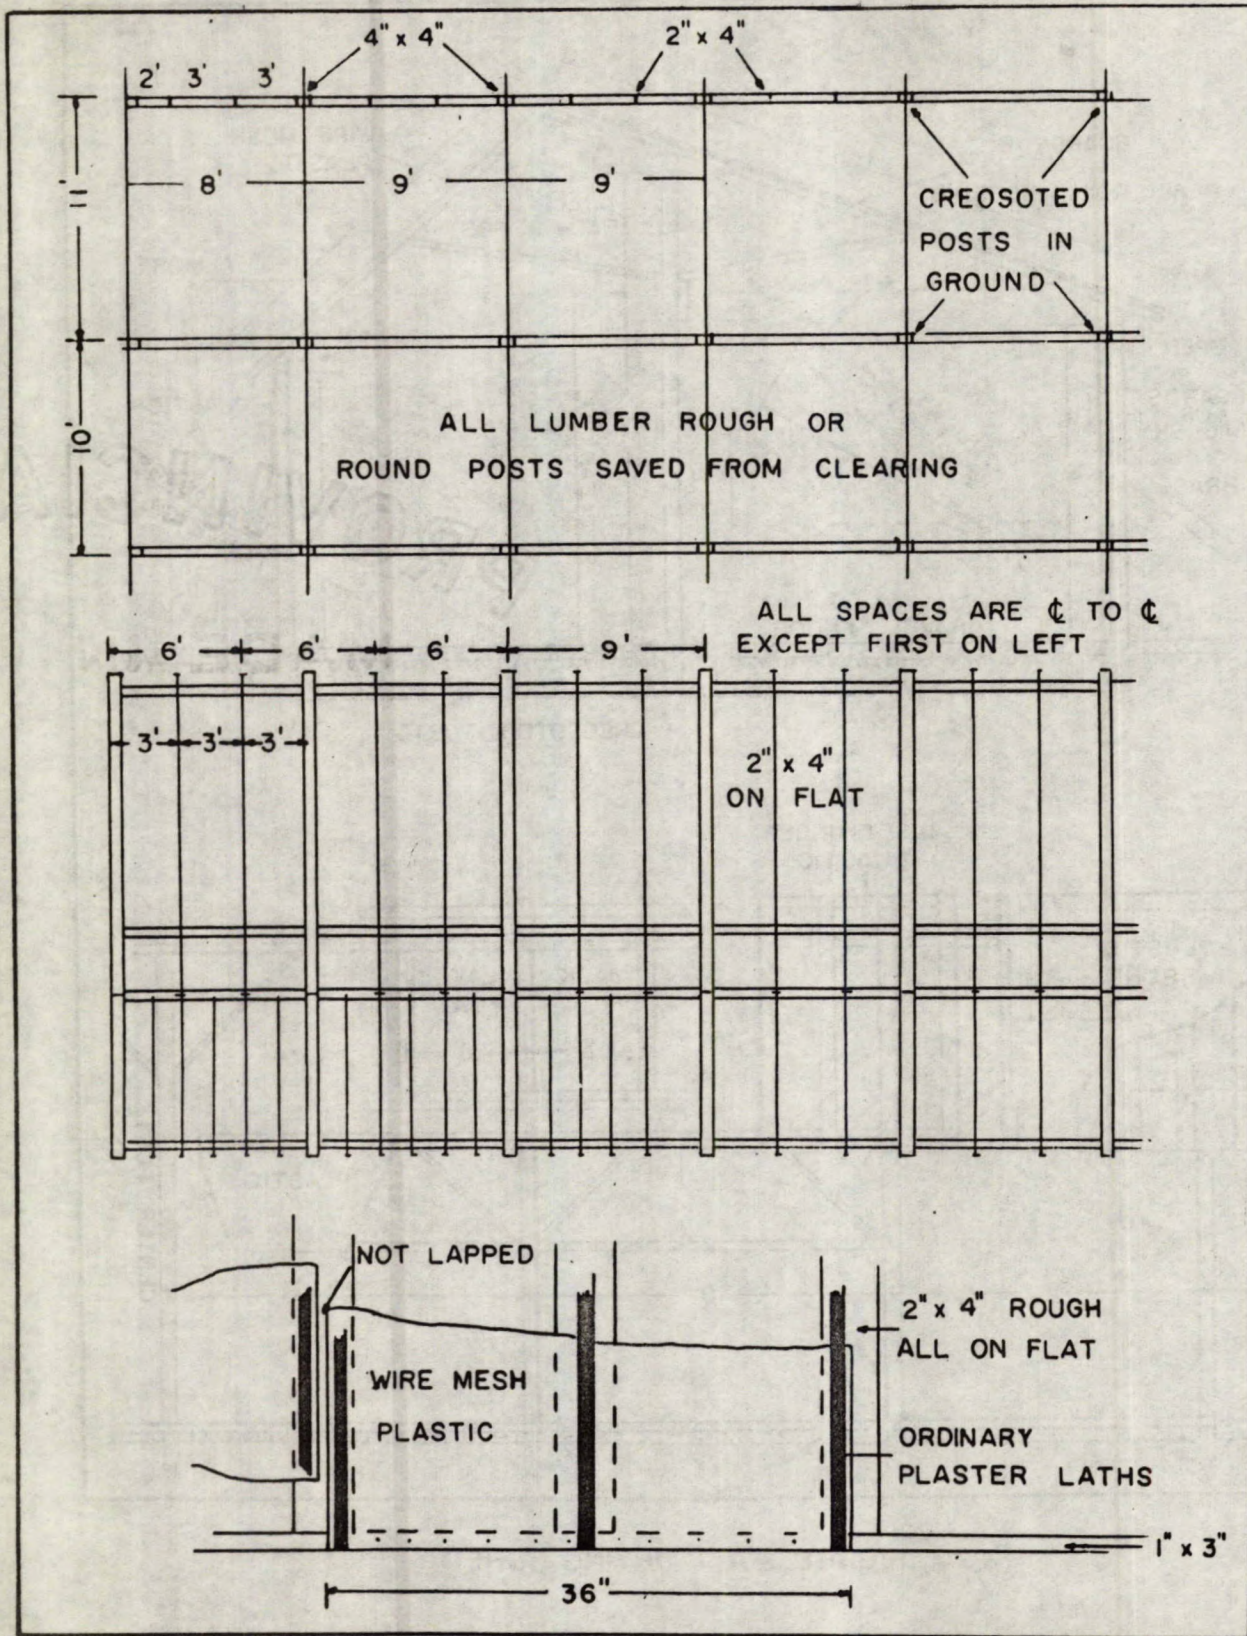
B - DRYING SHED - LAYOUT OF POSTS AND FRAME
